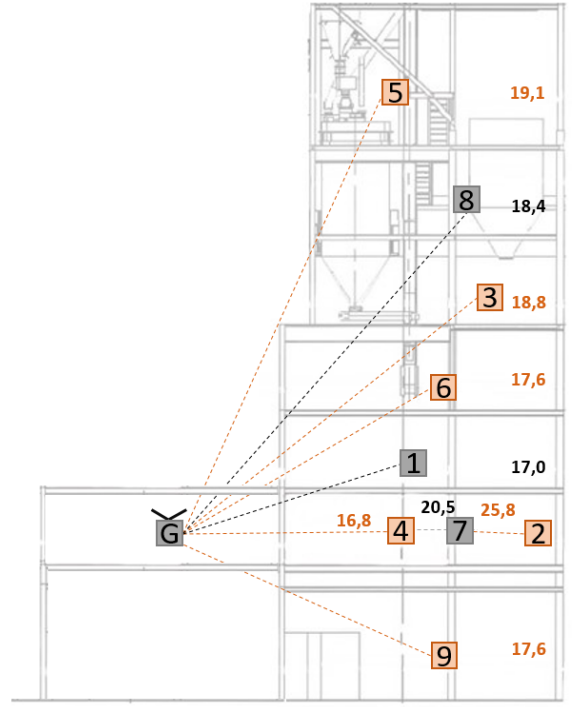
Floor plan of scenario 1 with distances (in m) between sensors (1 to 9) and gateway (G)
